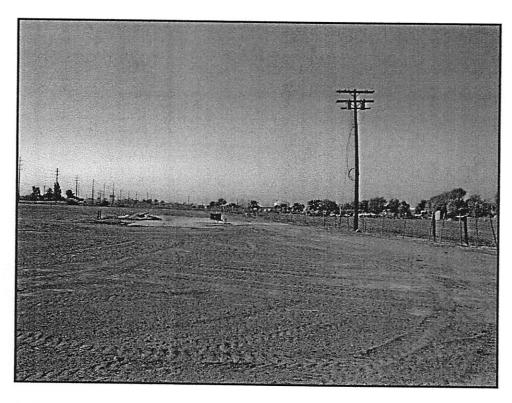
Looking south along the east side of the site. Note concrete pad of old shop building and the two transformers on the power pole.
